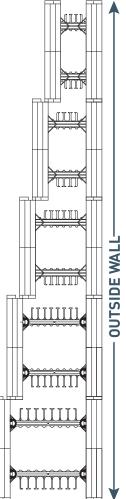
Remove the inner interlocking nubs on one side of the larger block for placement of the blocks together
